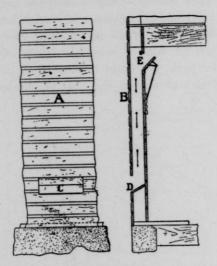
A wall section of a stable constructed of wood. The exterior A, shows the opening at C. The cross section B, shows the method of constructing the fresh air intake. The outside opening is shown at D and the inside at E. A simple but effective valve to regulate the supply of fresh air is also shown at E.
